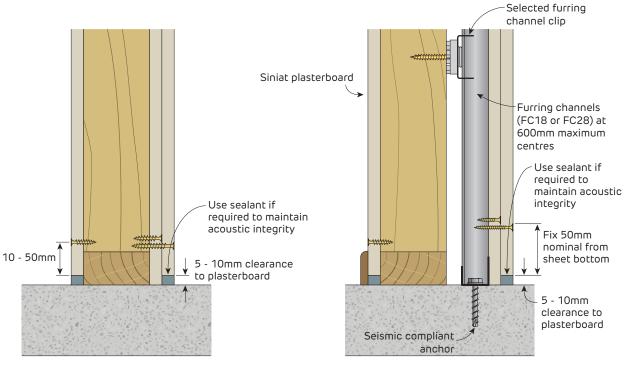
Wall Base FIGURE 14 Wall Base with Furring Channel Section Section
